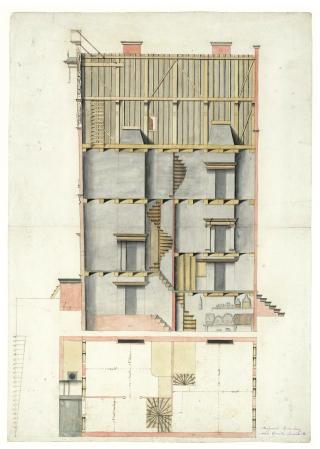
Section and ground-floor plan by Cornelis Danckertsz of unknown house in Amsterdam (no scale) (Danckertsz & Stadsarchief Amsterdam, 1678).
